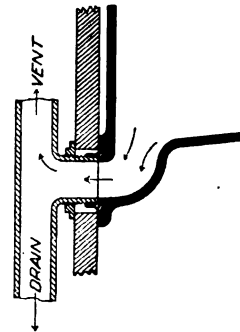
Part Section of Locally Vented Urinal and Connection.
